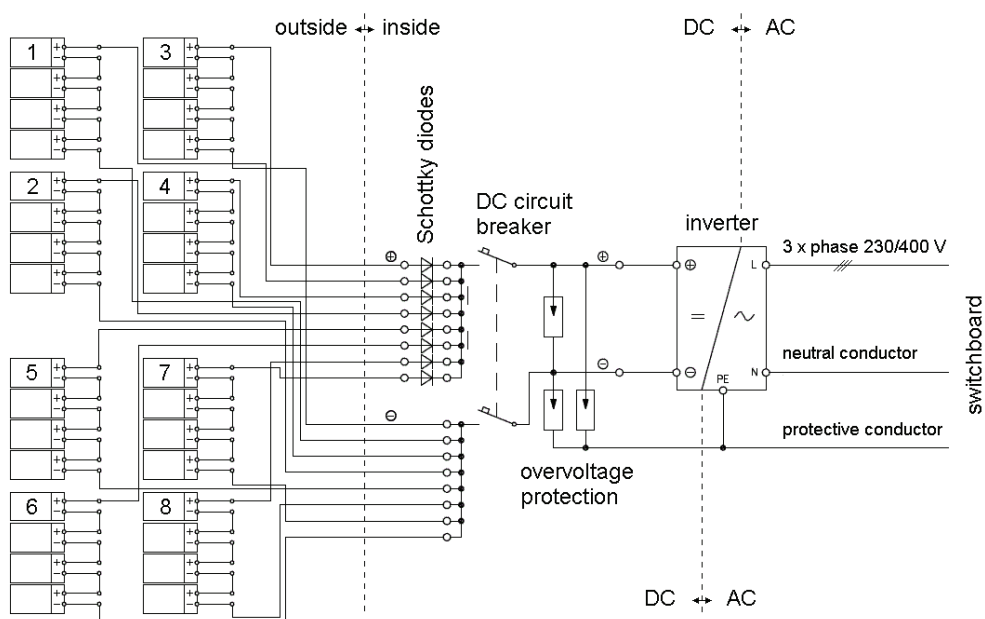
Wiring diagram of the PV power plant on the National Theatre New Scene Building roof.
